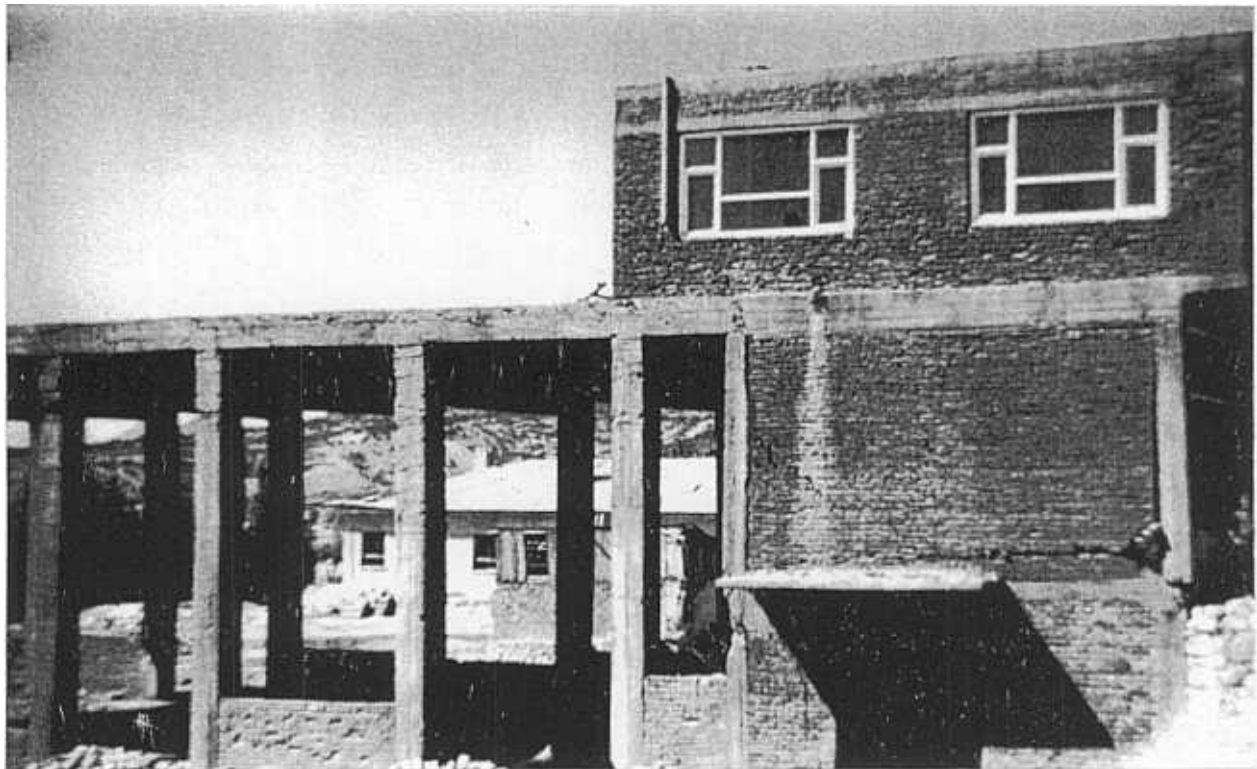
A REINFORCED CONCRETE BUILDING IN LICE THAT SUFFERED SOME COLUMN SHEAR FAILURES (LOWER RIGHT CORNER). A NUMBER OF THE BRICK INFILL WALLS HAD FALLEN OUT, MOSTLY ON THE OPPOSITE SIDE.
